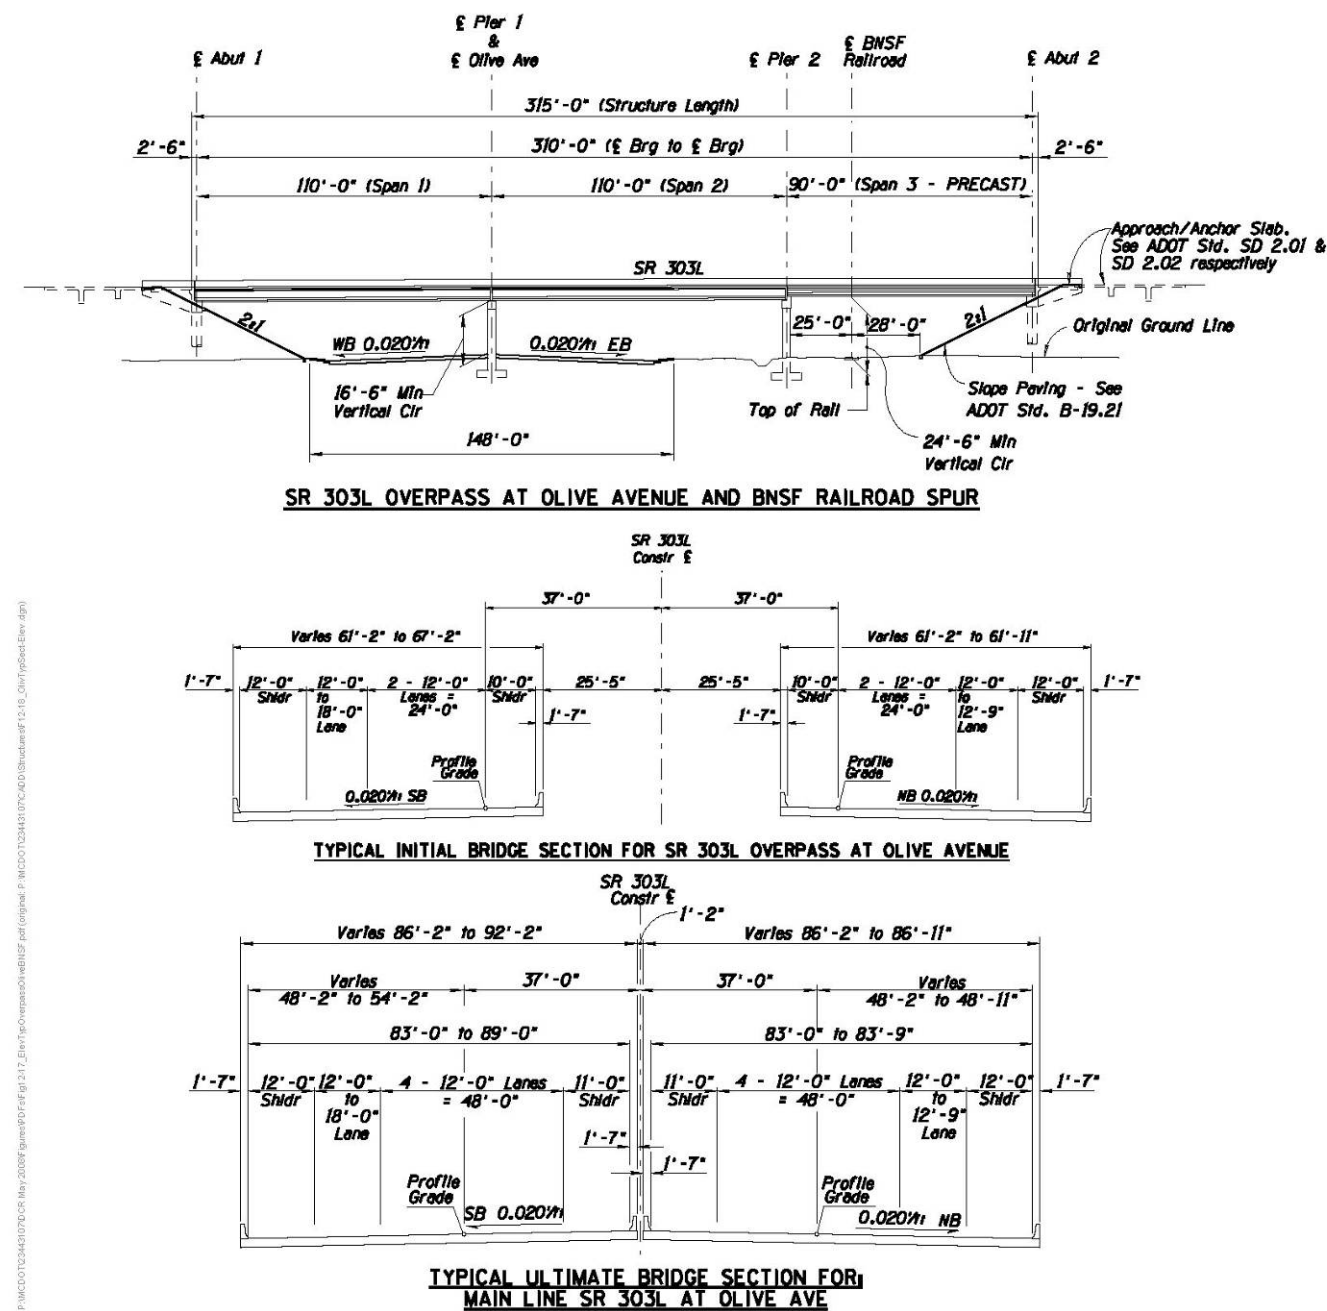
Elevation and Typical Section – SR 303L Overpass at Olive Avenue and BNSF Railroad Spur
